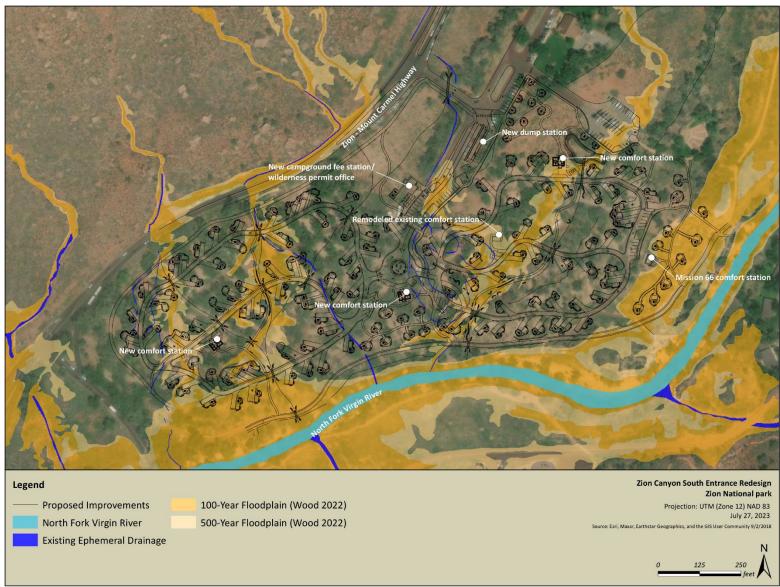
South Campground Overall Site Plan with Existing 100-year and 500-year Floodplains
